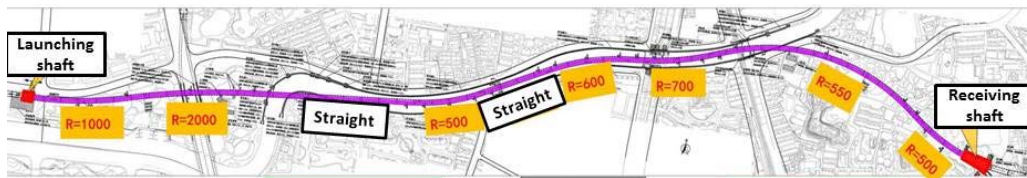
Plan of the newly built Shanghai North Highway Tunnel
